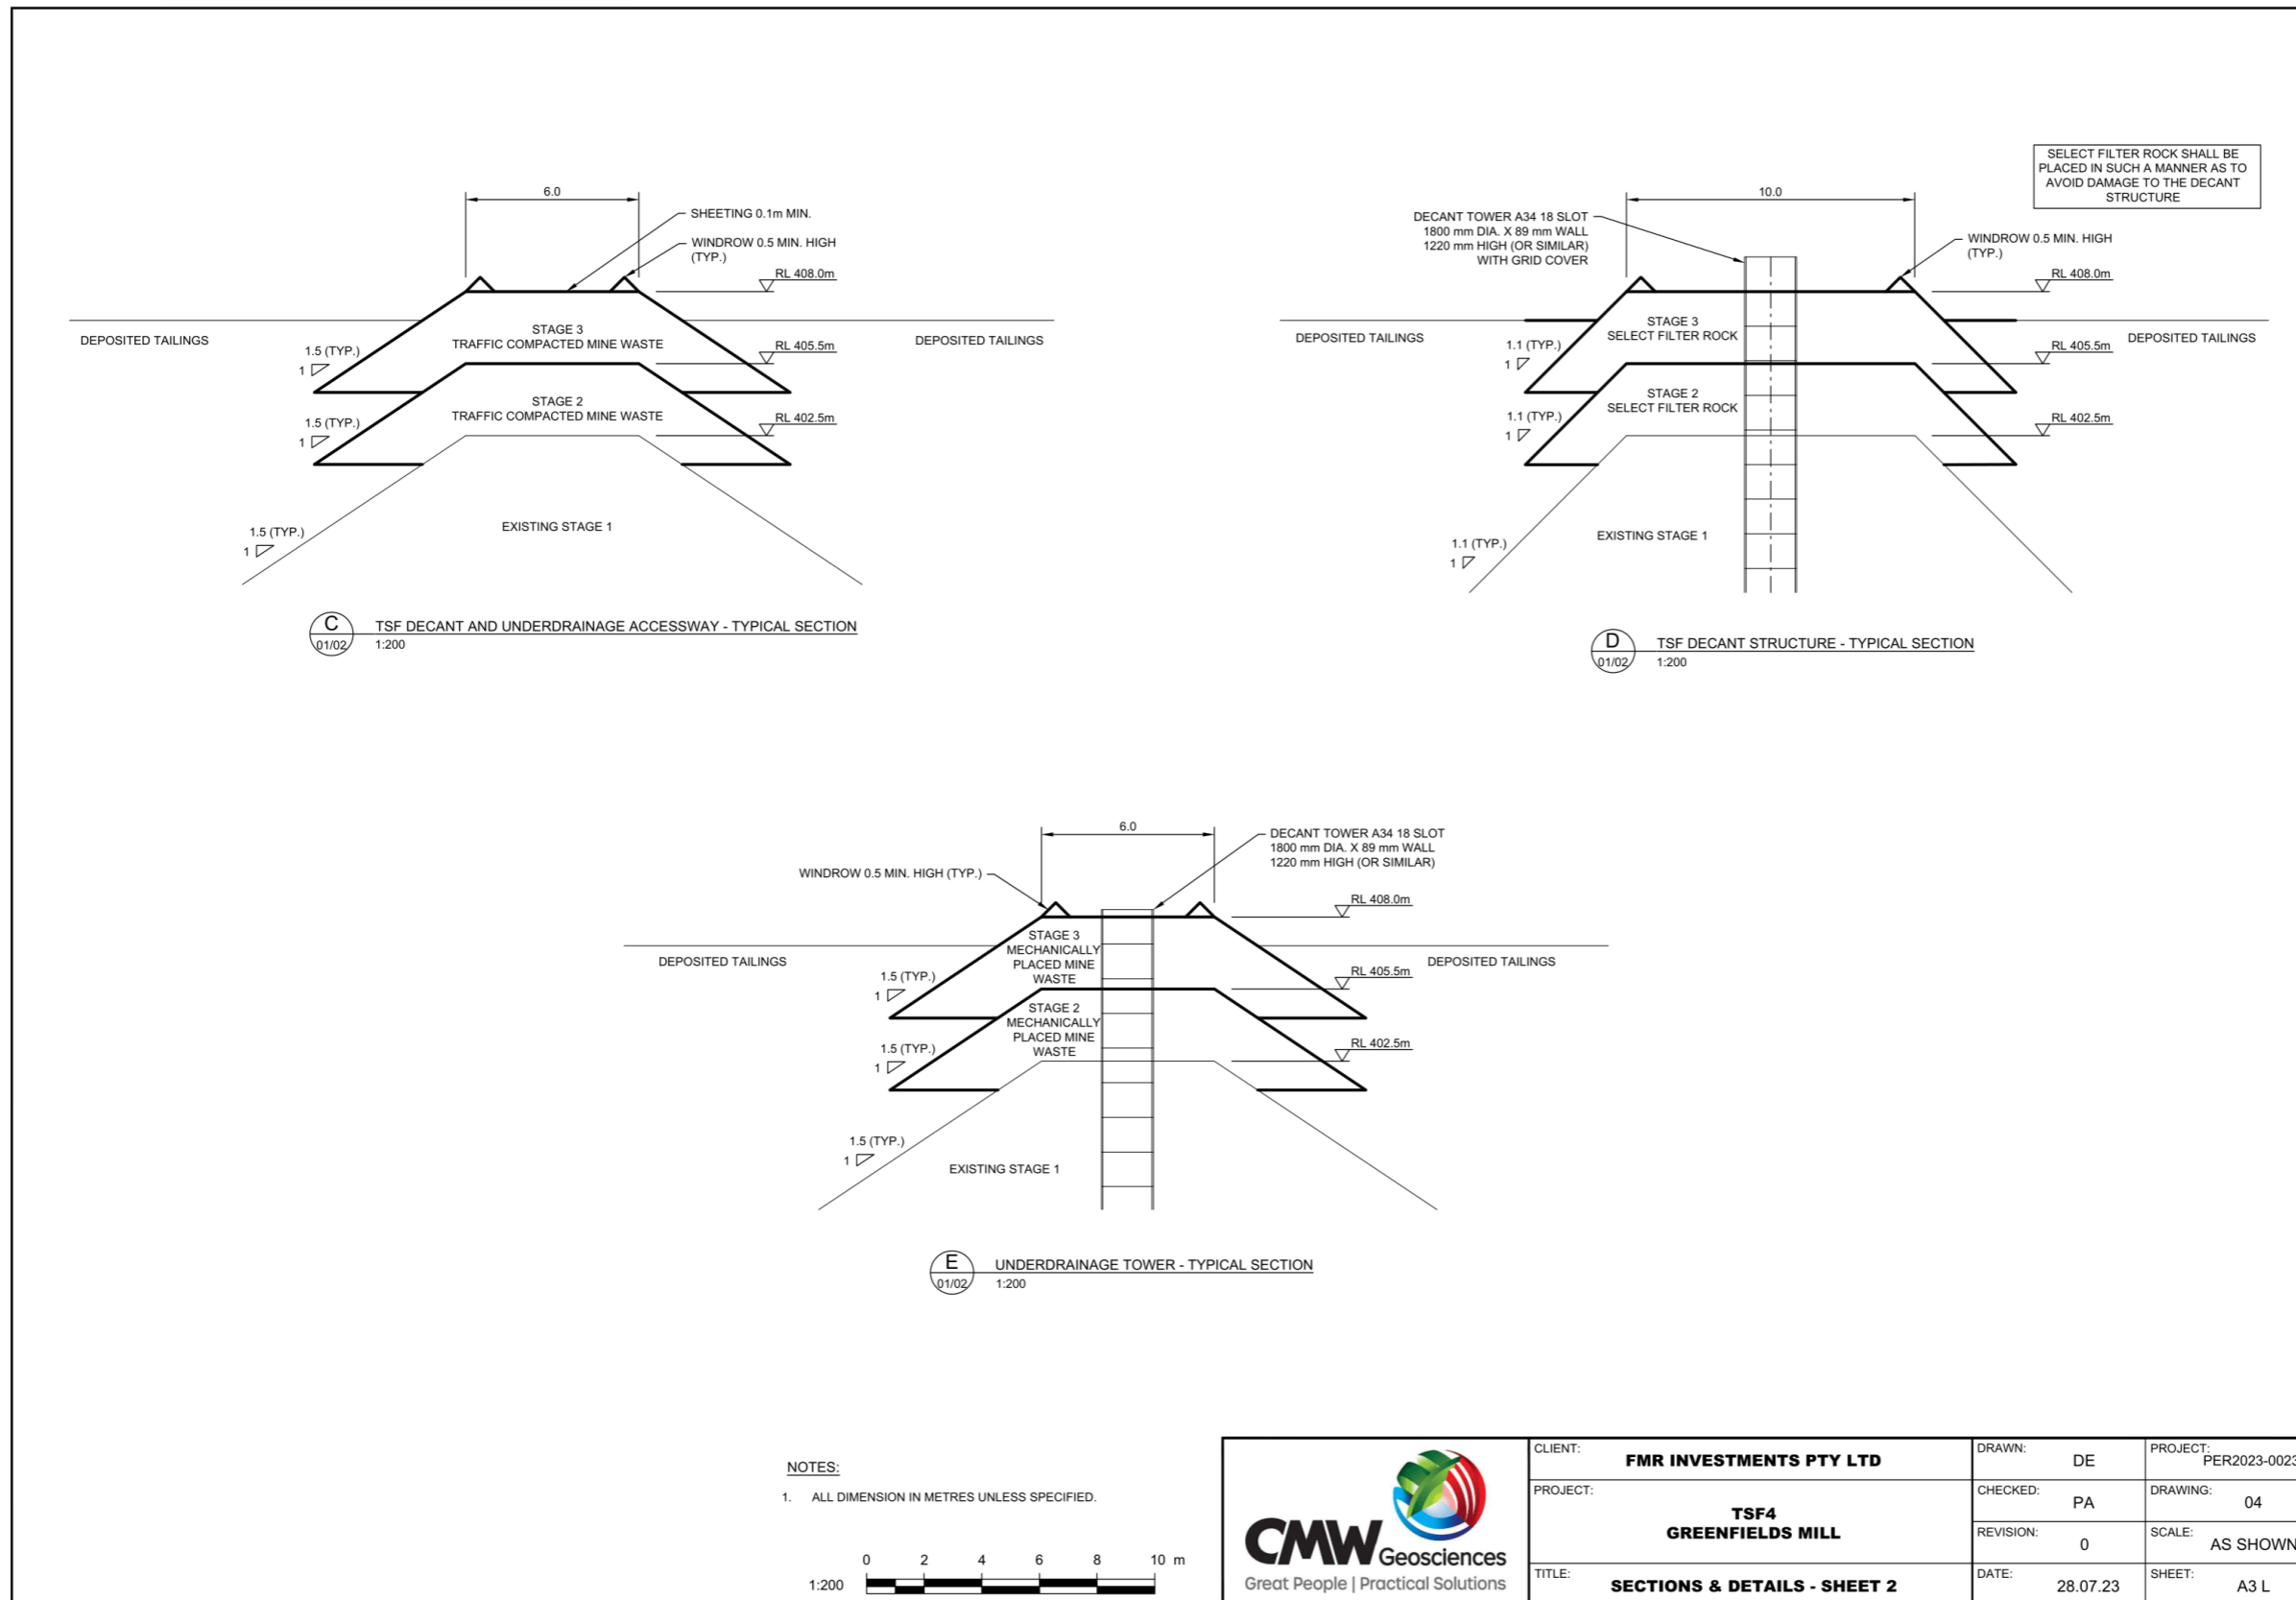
Design drawing for TSF4 Stage 2 and 3 embankment raises – decant structure, underdrainage tower and accessway
